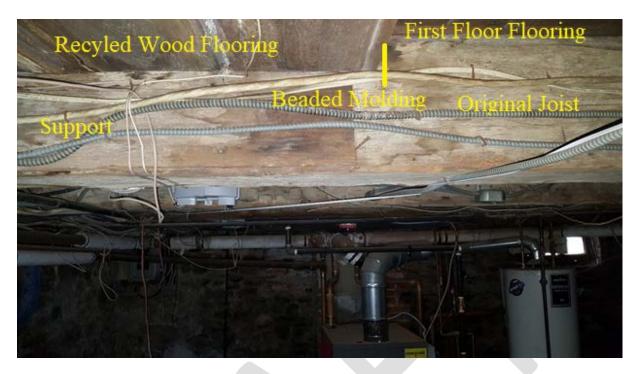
Carpenters recycled earlier flooring and strung them across several joists to support the tile in the vestibule. The boards were lowered and held in place with a support nailed to the original joists. The end of the box was closed in with beaded molding that was also recycled during the remodeling. The boxed in framing would have held a mortar mix for the tiles. Photograph by Mark Nonestied
